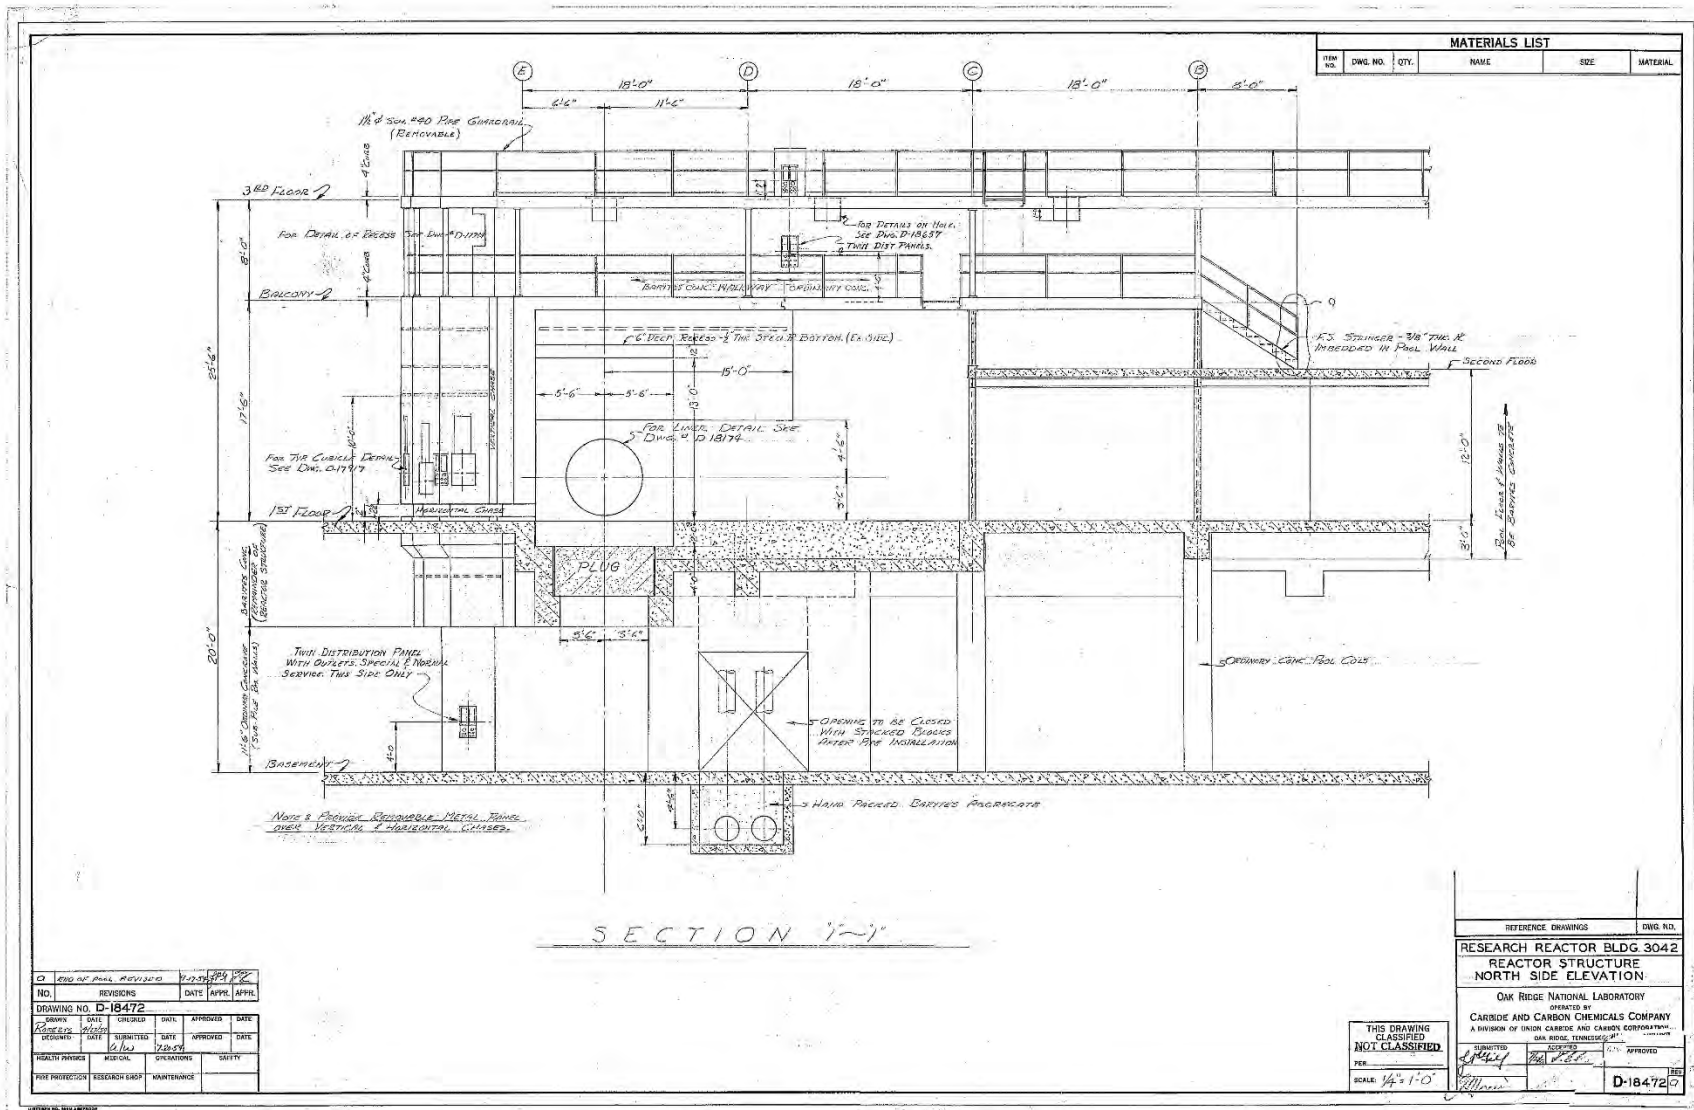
North elevation of the Oak Ridge Research Reactor structure in Building 3042 (Oak Ridge National Laboratory, April 27, 1954).
